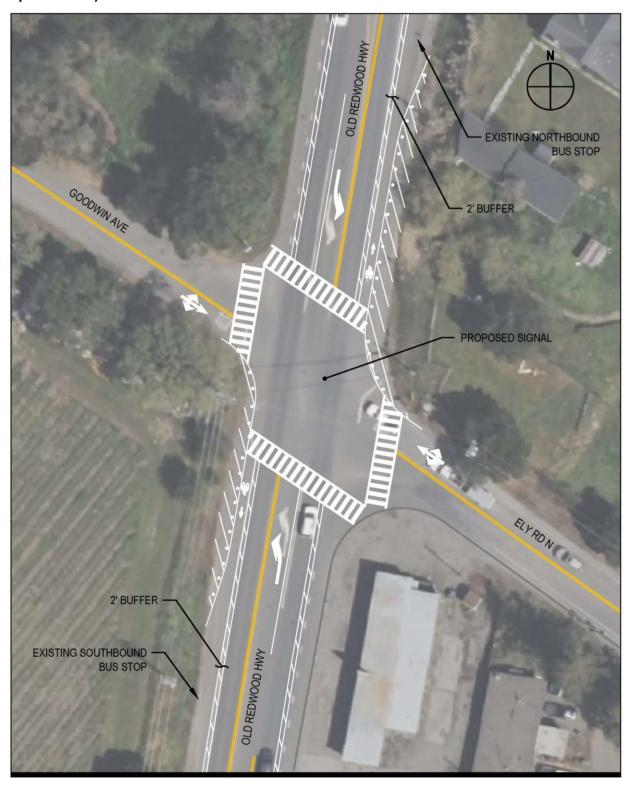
Phase 1 Proposed Restriping: Old Redwood Highway at Ely Road (with Intersection Improvements)
